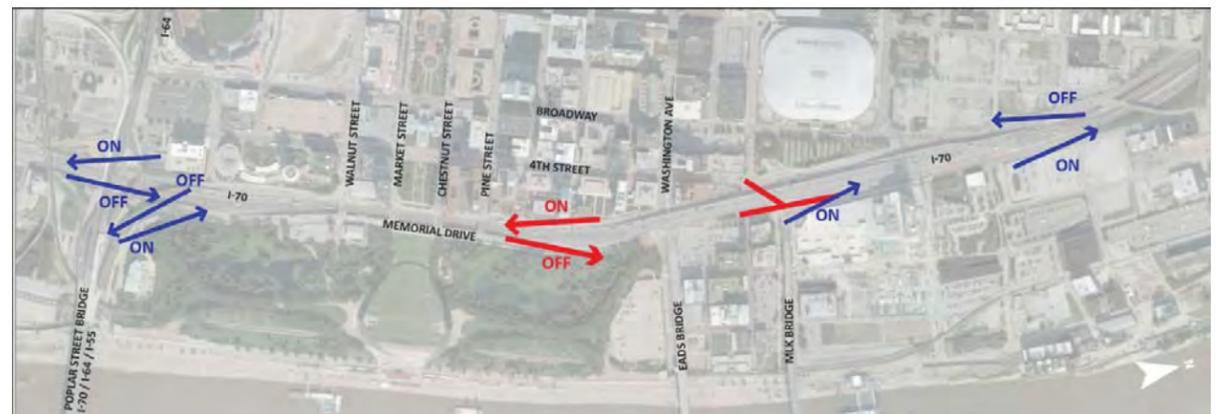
Proposed Ramp Configuration, Downtown St. Louis
